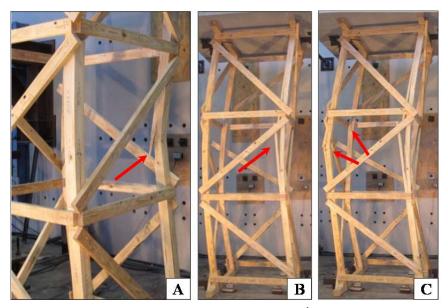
Failure Sequence A) 1st Failure B) 2nd Failure C) Final Failures
